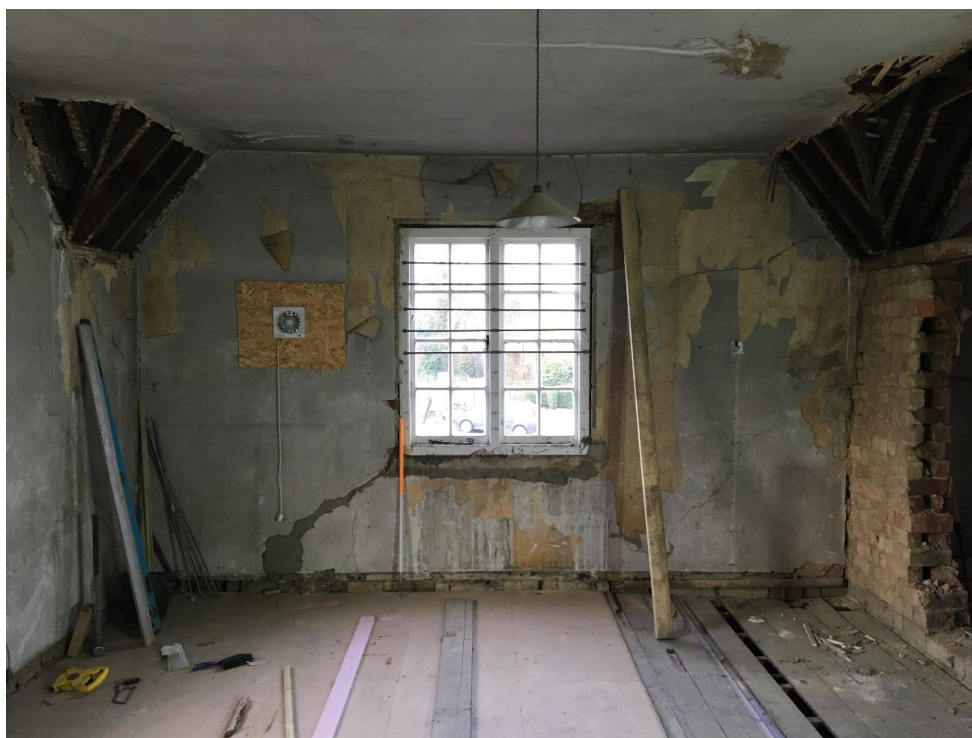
View W showing two-light casement window in W wall of southernmost room on first floor
